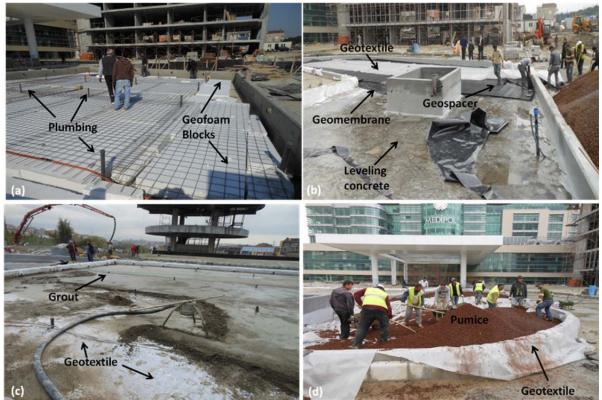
Reflective pool and main green island construction (a) Plumbing of the pool and geofoam block layout, (b) Geocomposite drainage located on top of leveling concrete over the geofoam blocks in reflective pool, (c) Capping the geocomposite with grout for the reflective pool bottom, (d) Placing granular pumice and top soil over geocomposite at the main vegetation island
